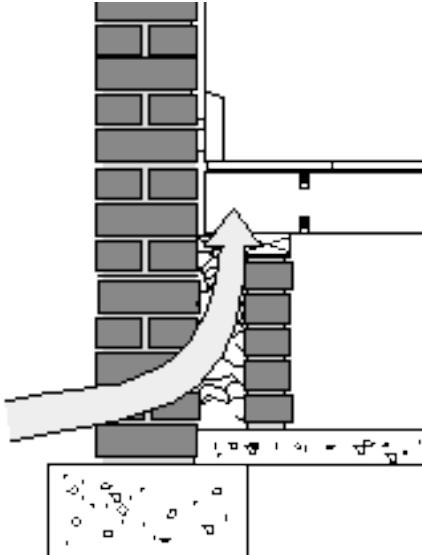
Debris or builders' rubbish may bridge the DPC
